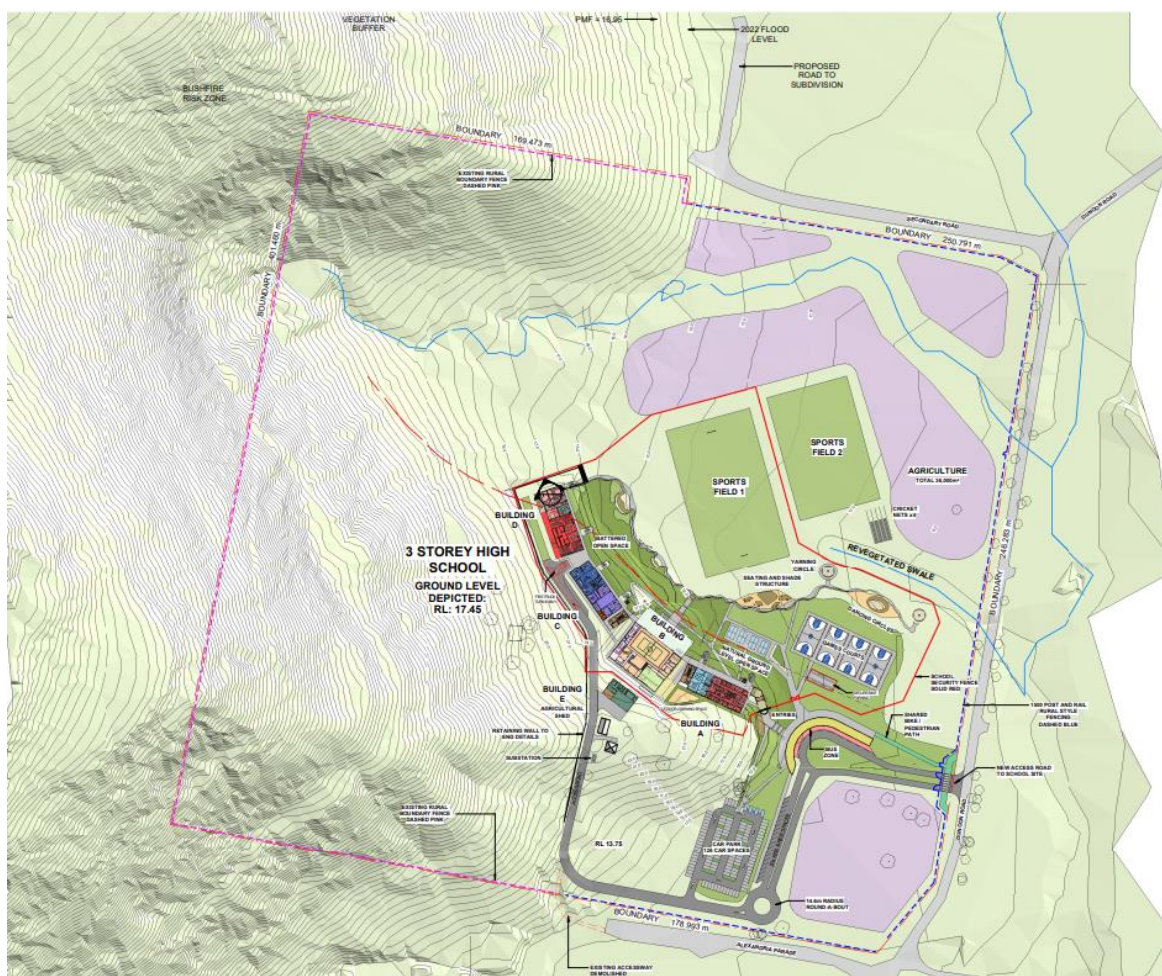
Overall Site Context Plan (Source: EJE Architecture)
